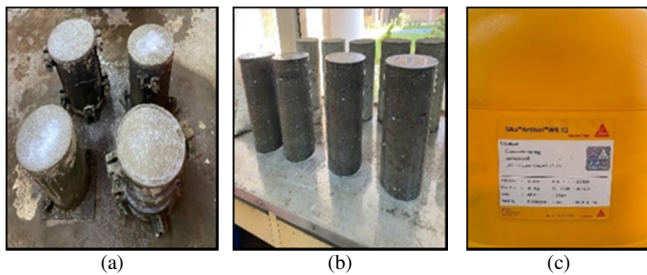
Liquid-membrane curing: (a) after the first moist, (b) after being taken out of the mold, (c) Sika-Antisol-WB.
